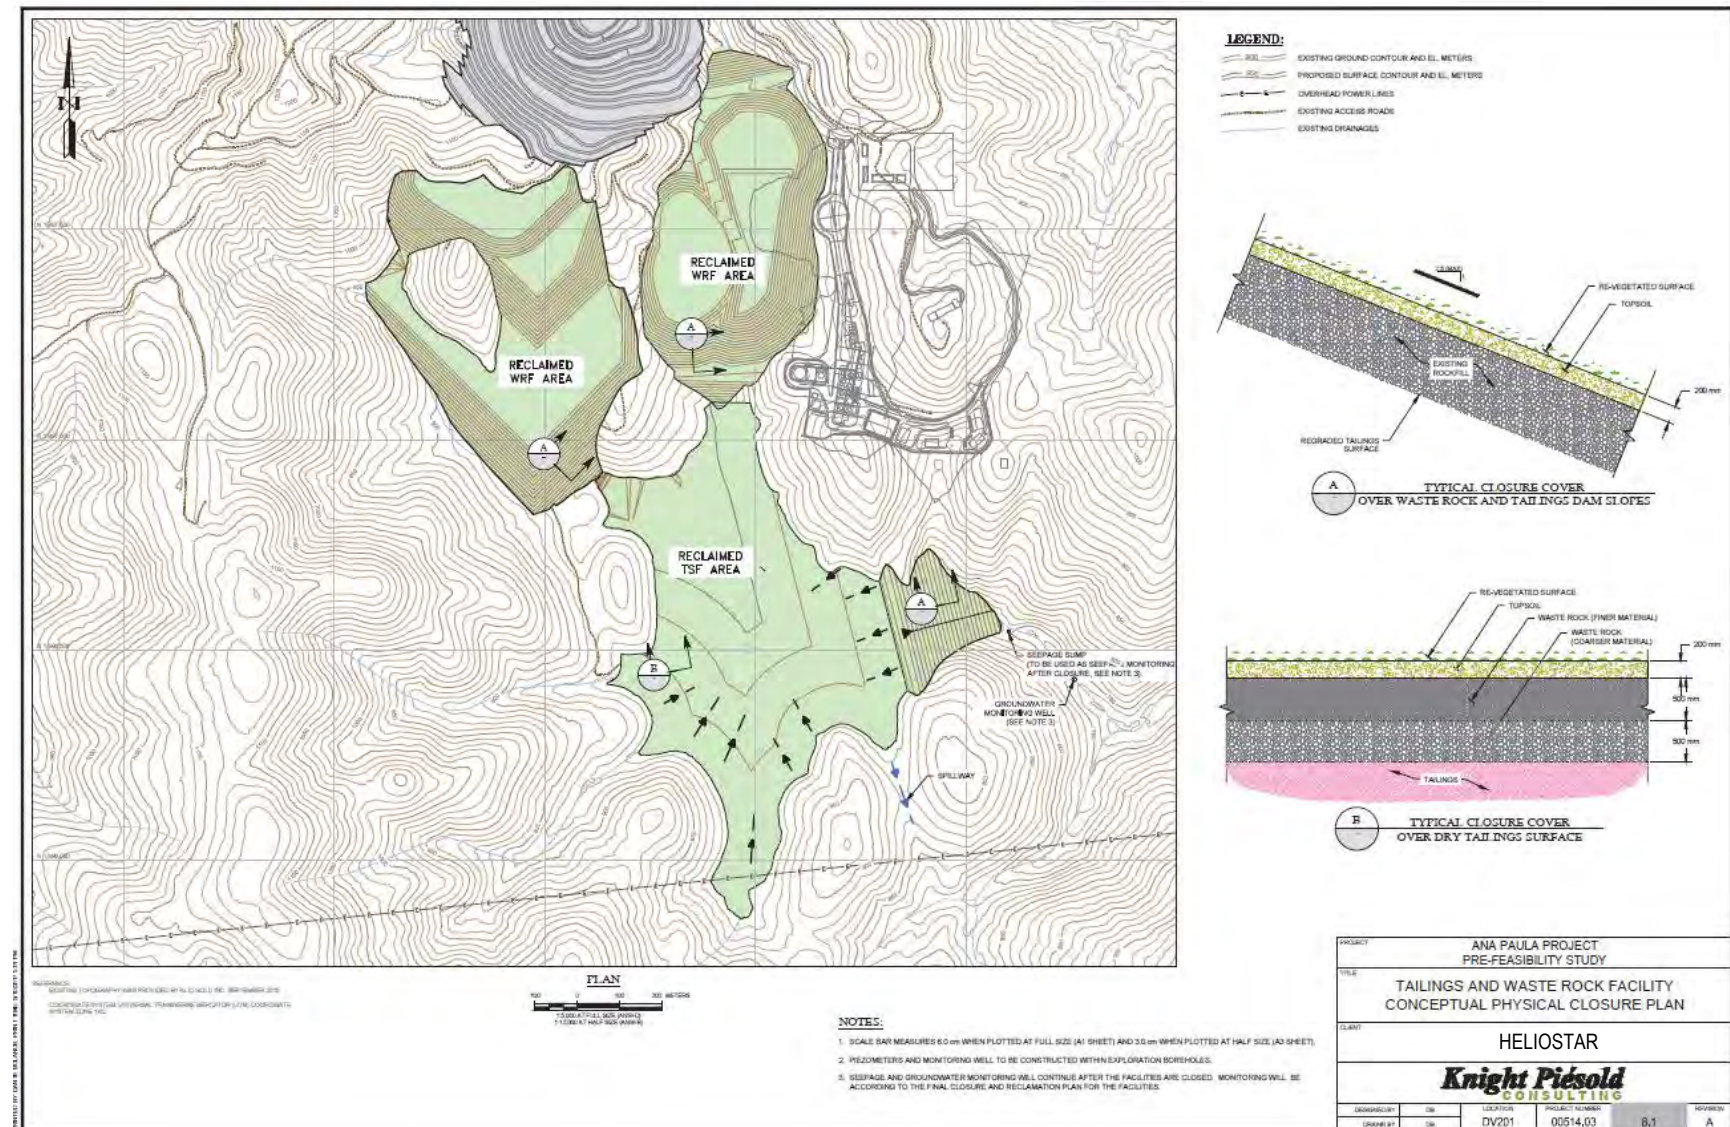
Tailing and Waste Rock Facility Conceptual Physical Closure Plan
